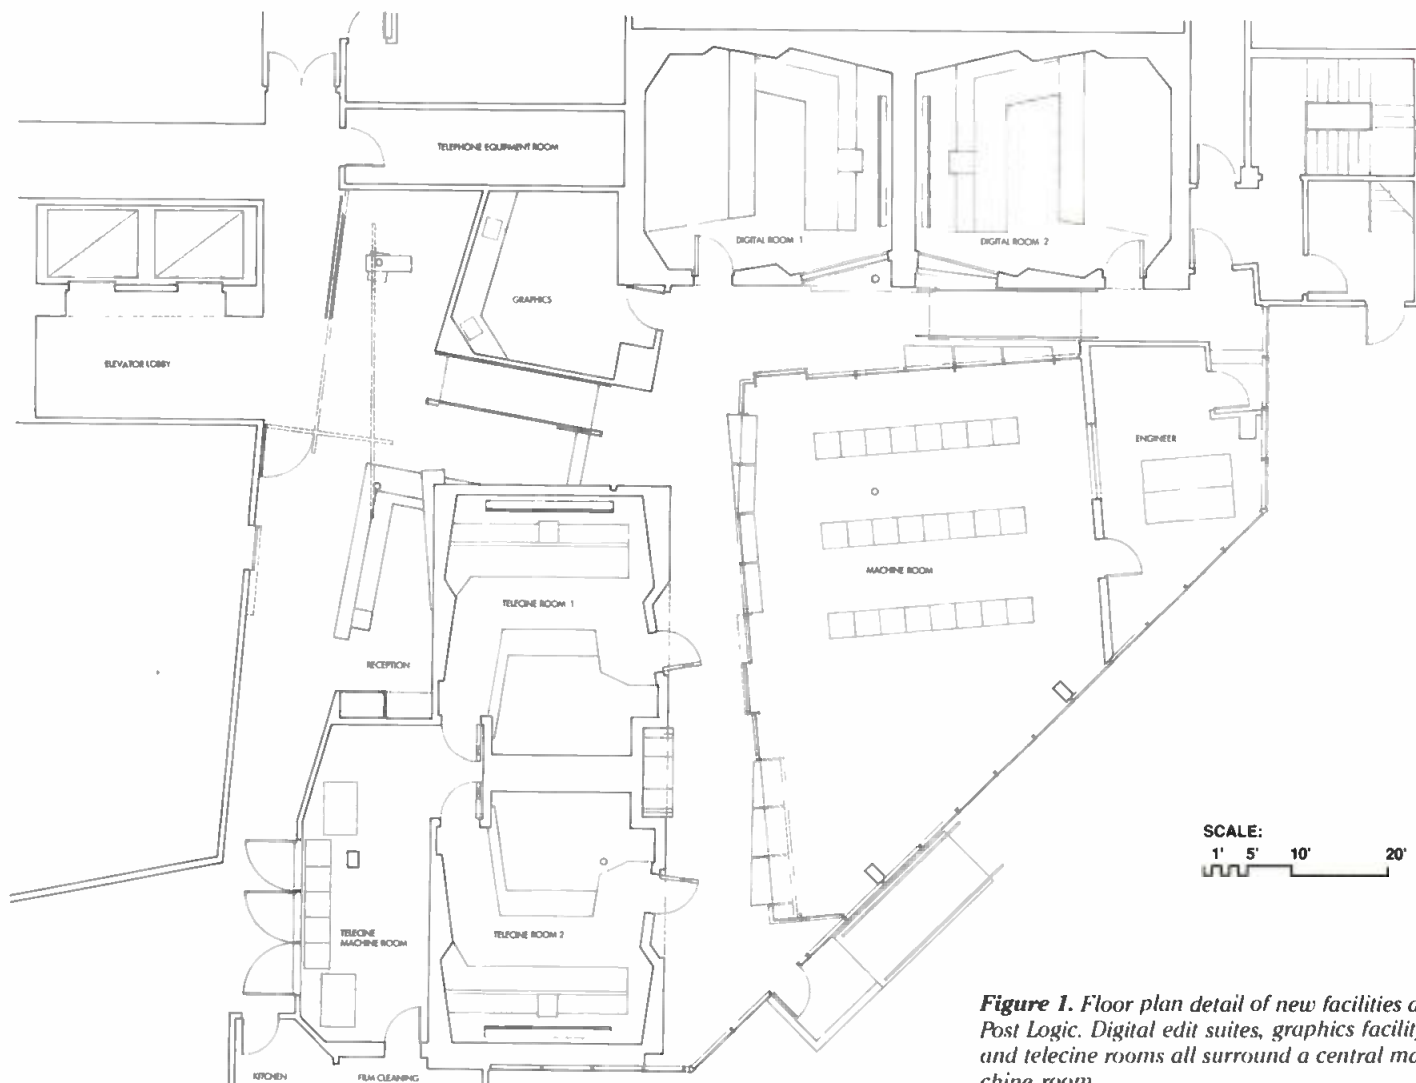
Floor plan detail of new facilities at Post Logic. Digital edit suites, graphics facility and telecine rooms all surround a central machine room.
